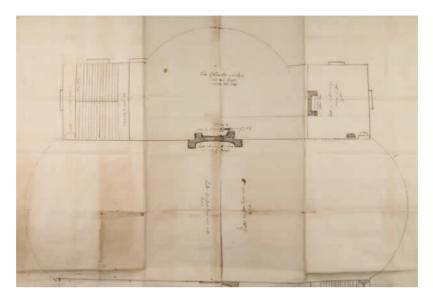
Partial ground floor plan for Lamport Hall. (Kent History and Library Centre, U1015 E3)
